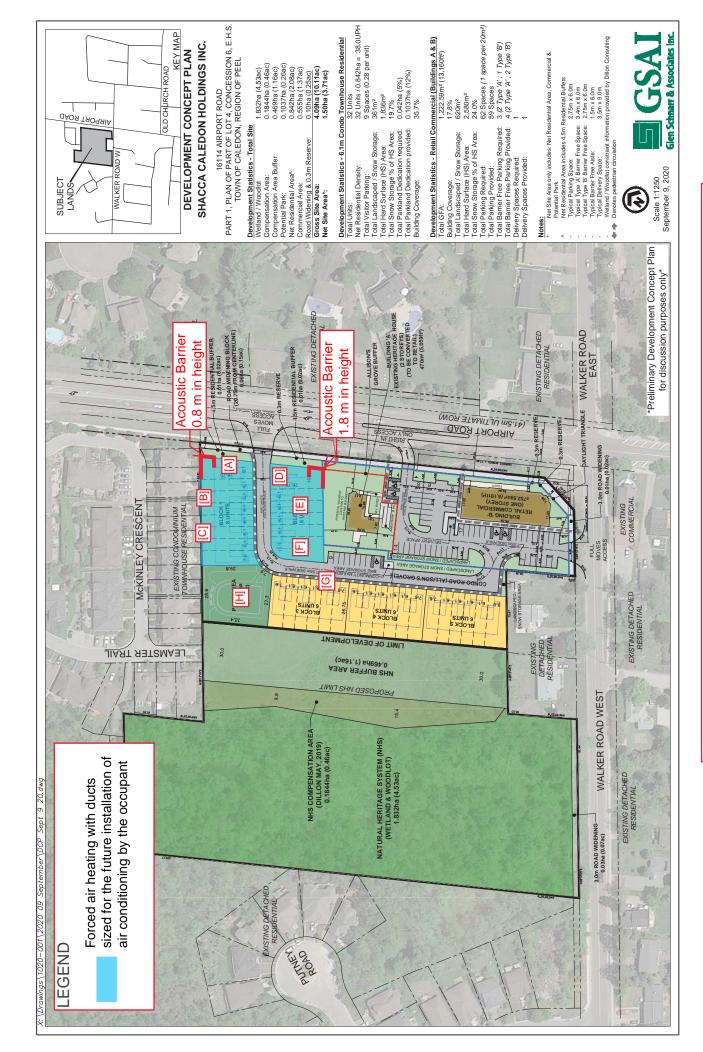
Proposed Concept Plan Showing Barrier and Ventilation Requirements
